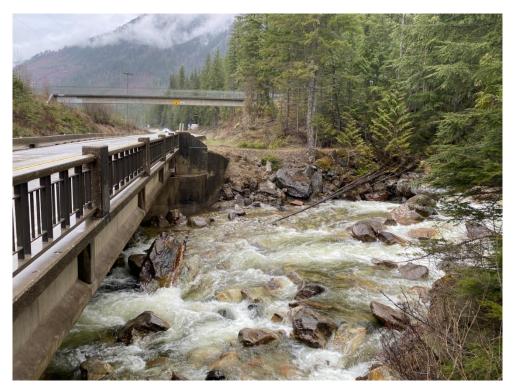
View looking north (upstream) at the downstream wing wall of the west abutment (Photograph by BGC taken on April 26, 2023).
